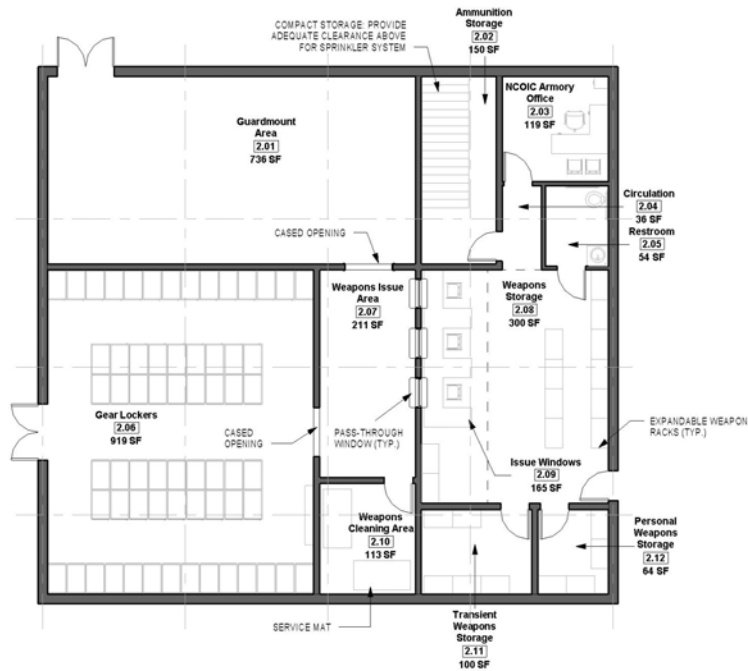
Module 2: Guardmount/ Armory – Floor Plan
